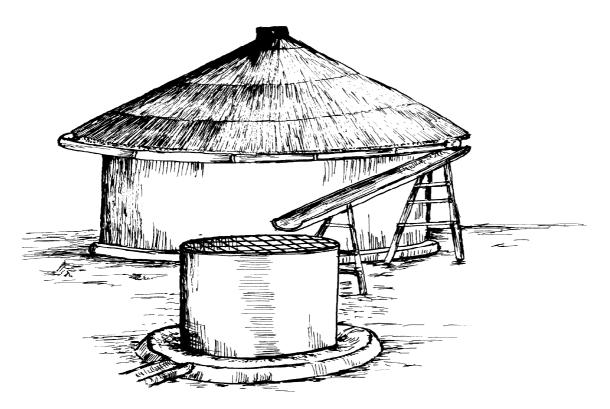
Gutter used to collect rain water from the roof and stored in large tanks
